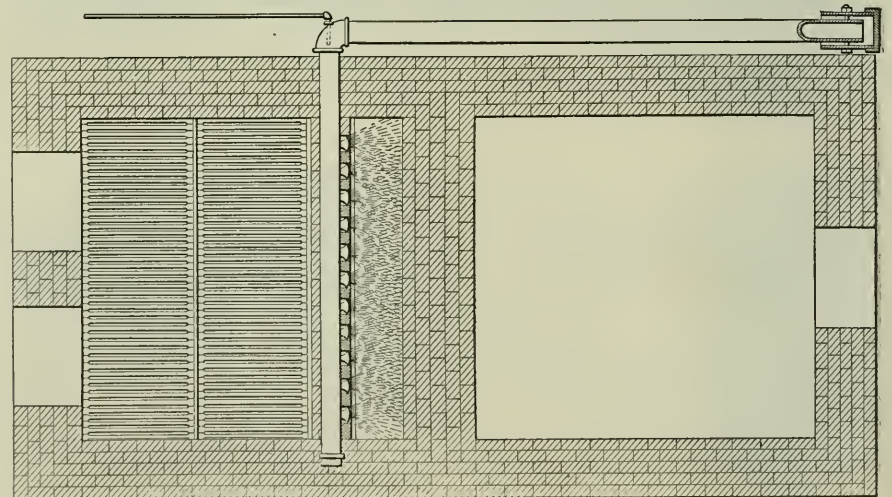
SECTIONAL PLAN OF BOILER SETTING
